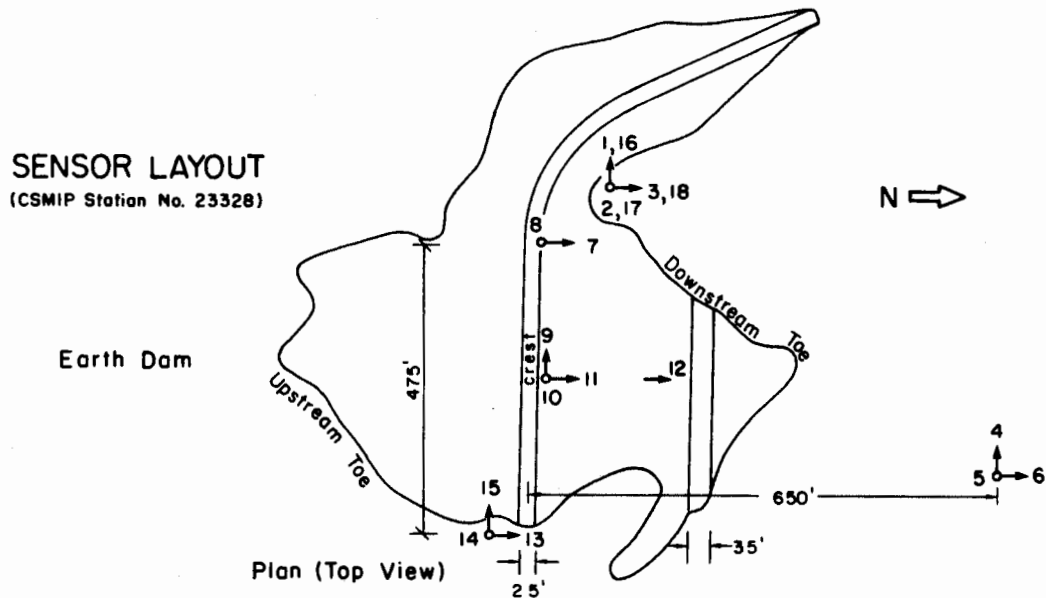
Plan View of Puddingstone Main Dam Showing Sensor Locations
